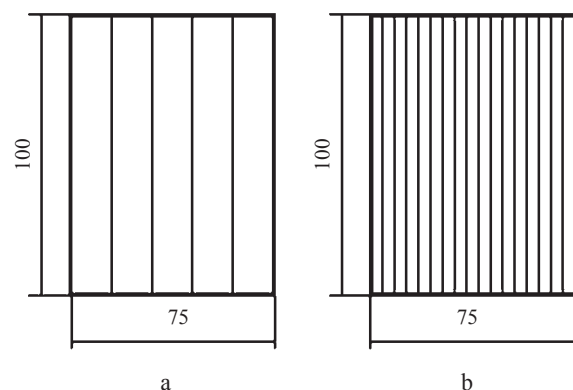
A schematic of specimen cross-sections: a) oak and pine glulam beams; b) LVL beams
